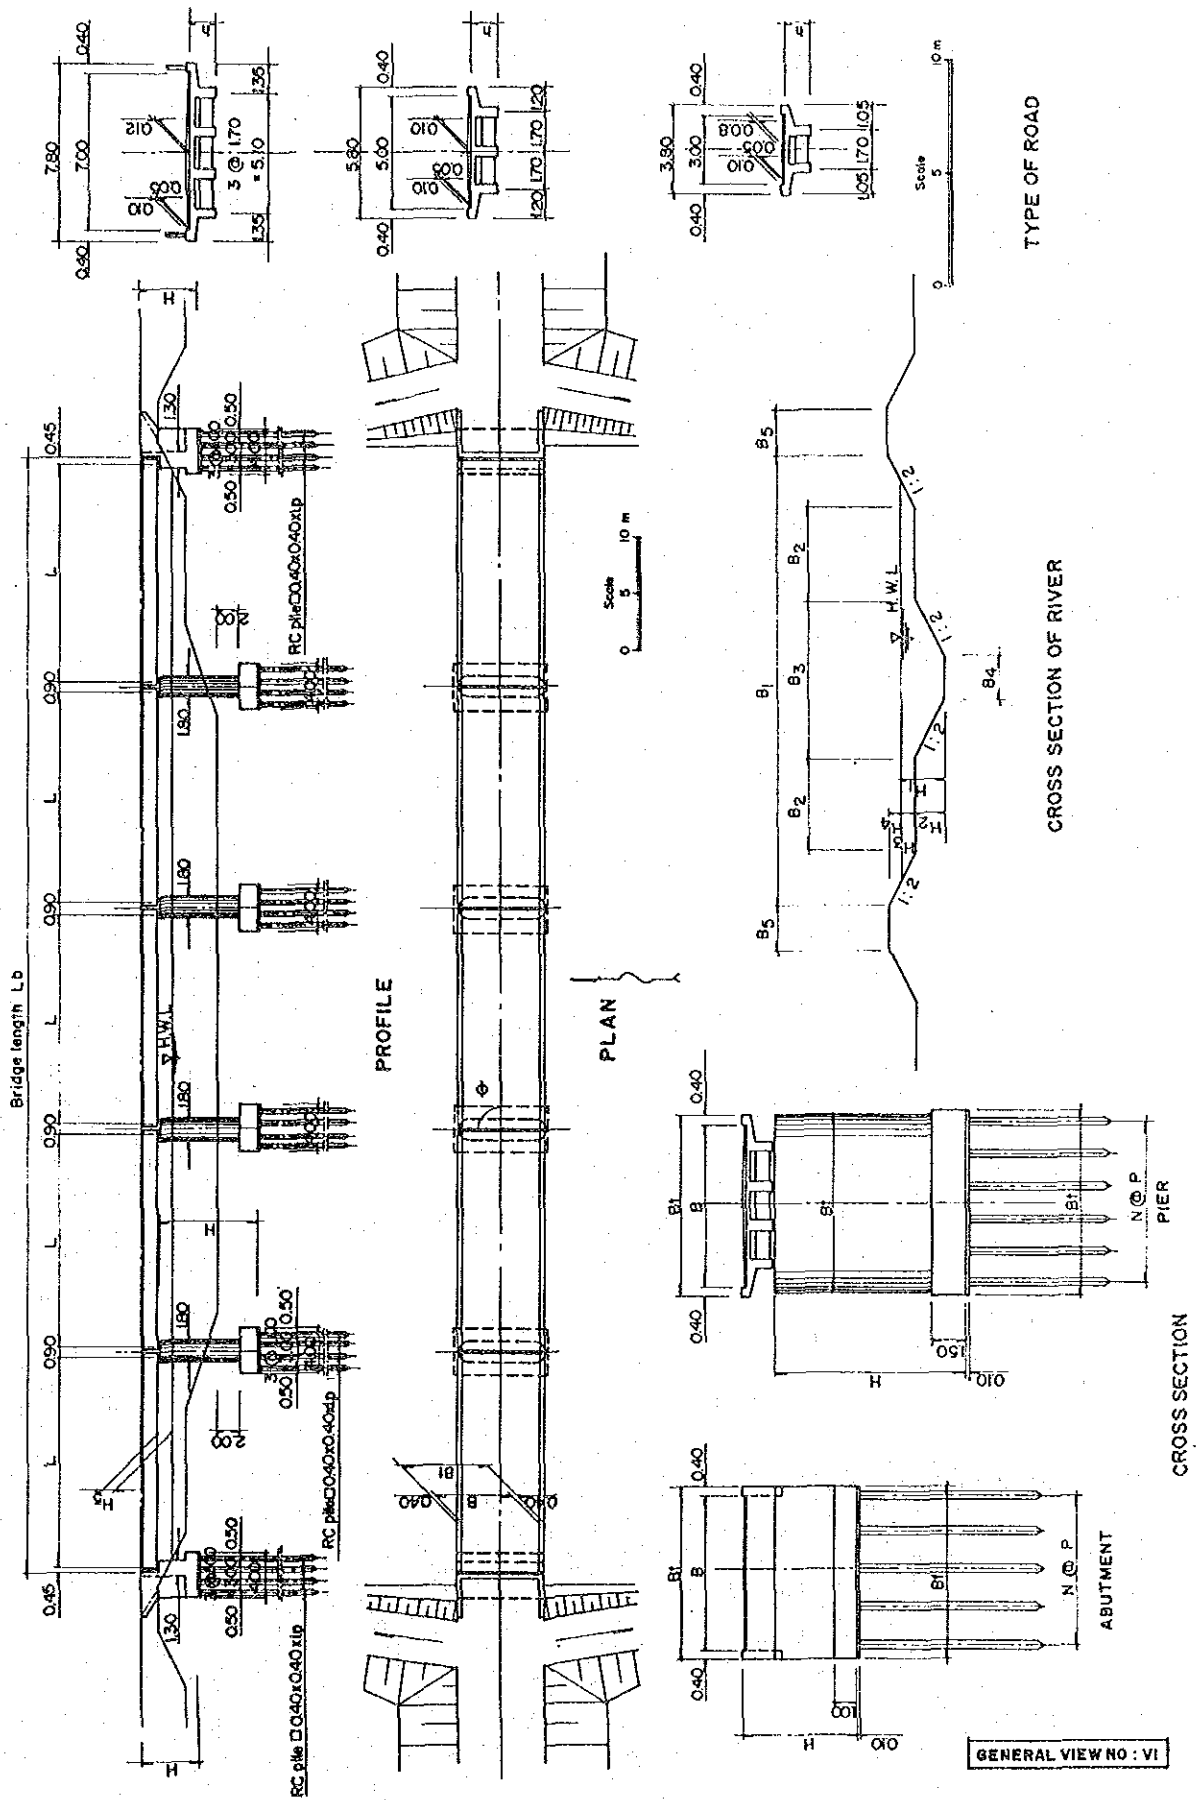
STANDARD DESIGN OF BRIDGE (1/4)
